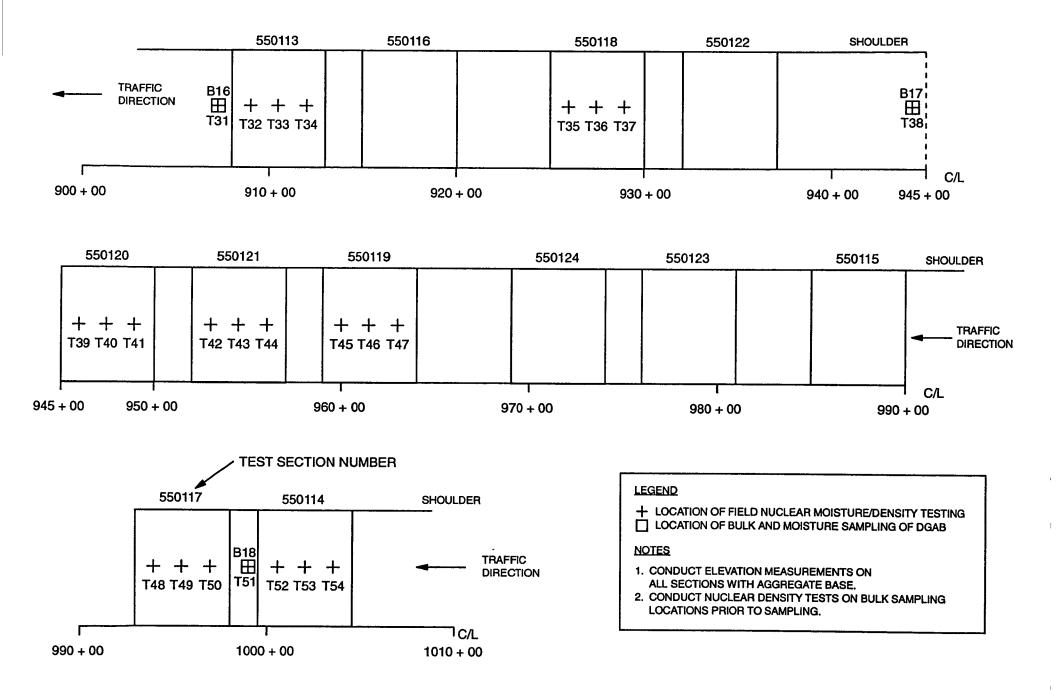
Overview of Sampling and Testing Plan for Aggregate Base.
